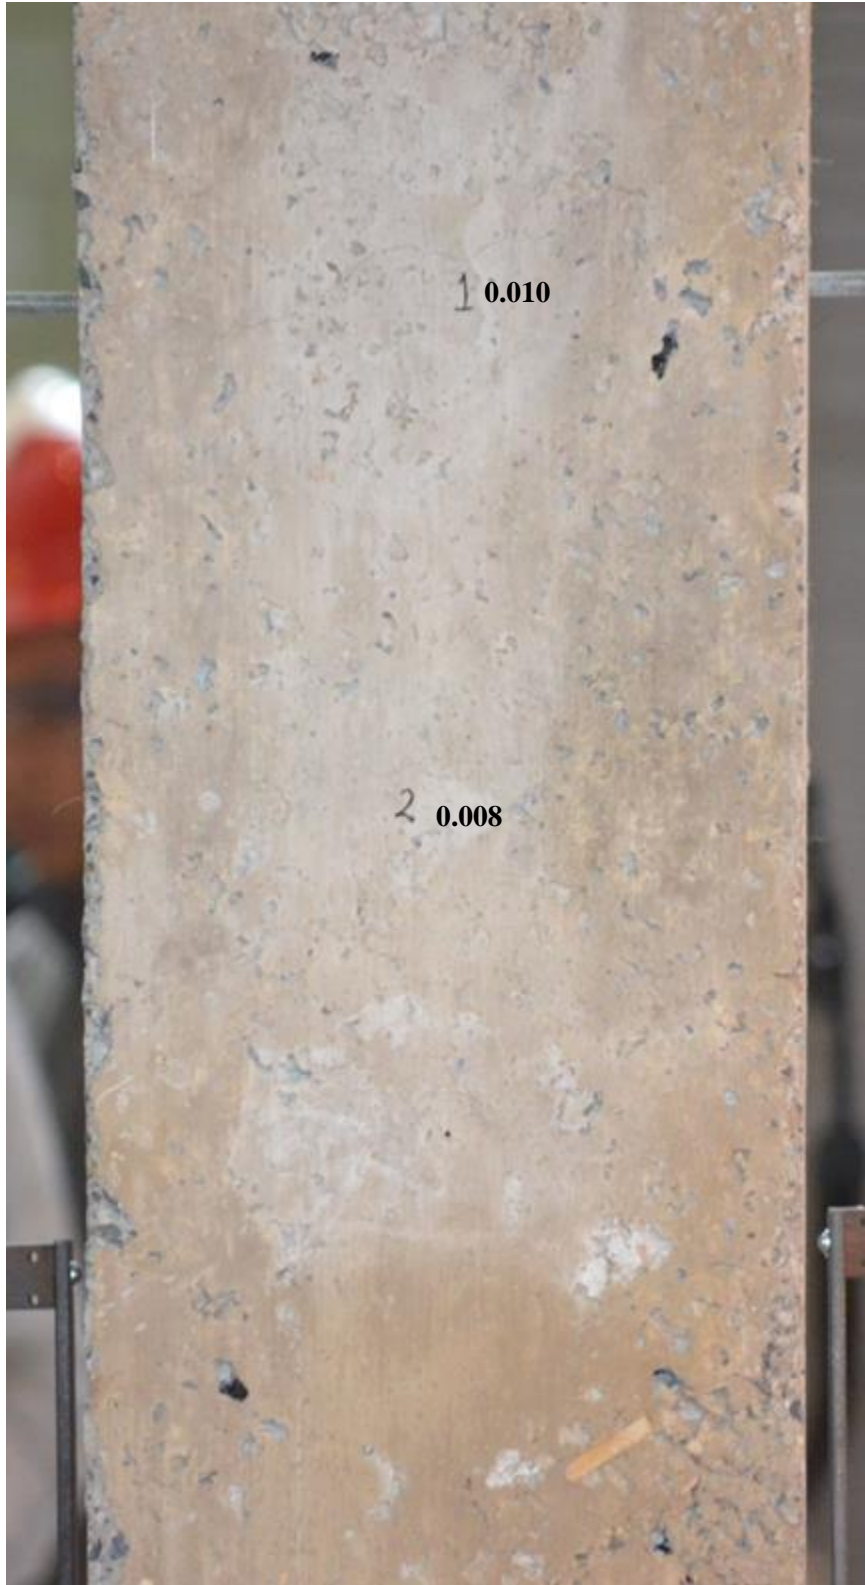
Cracks on east face of TS02 at Load Step 08
